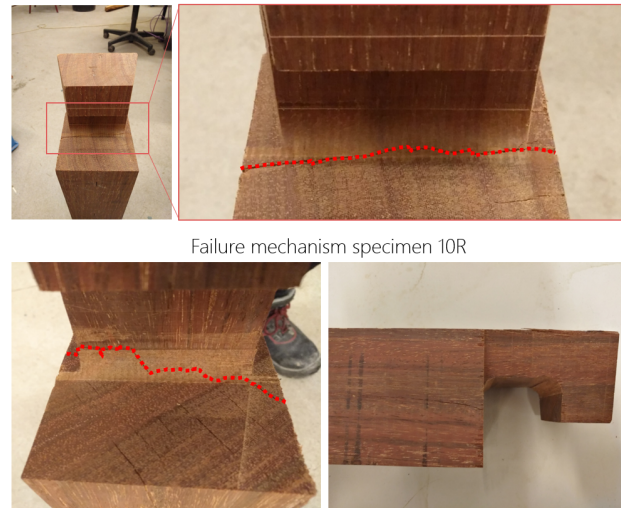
Failure mechanism of the specimens with rounded edges (specimen 6R and 10R)
